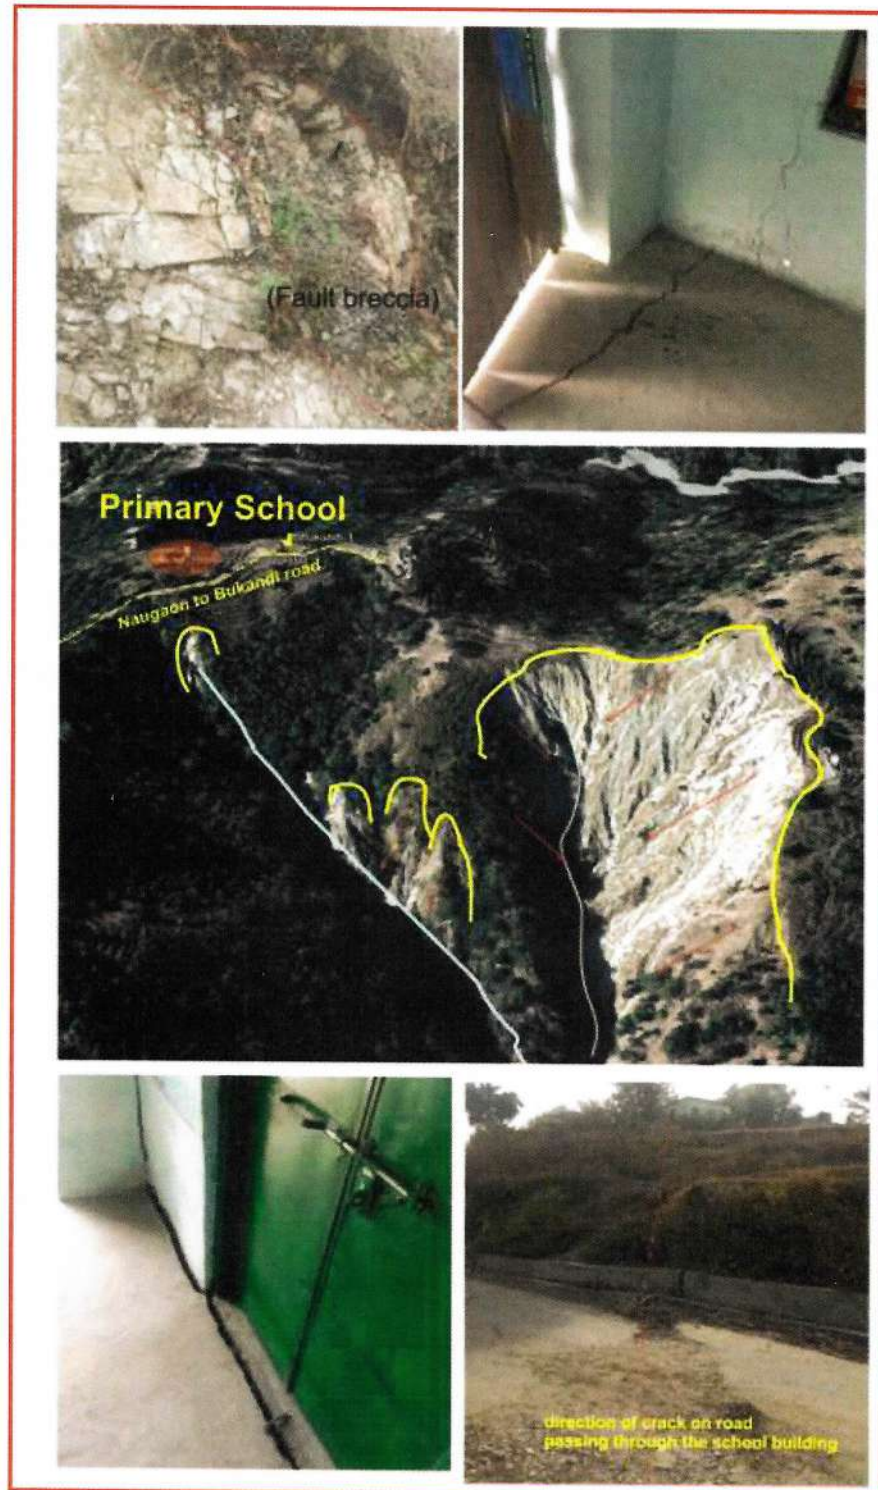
exhibiting the condition at spot 1 where landslide scarp can be seen below the school building. A crack observed in the school building as well as on road is just extension of landslide scarp.
